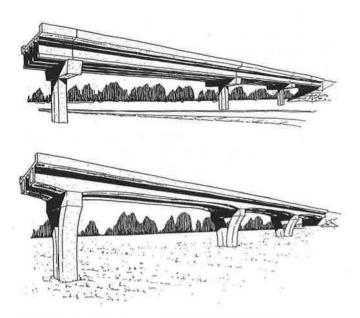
Metro Link bridge: (top) preliminary engineering phase—post and lintel bridge with constant depth beam on hammerhead piers; (bottom) final design—cast-in-place slingshot piers with haunched beamed curved superstructure.
